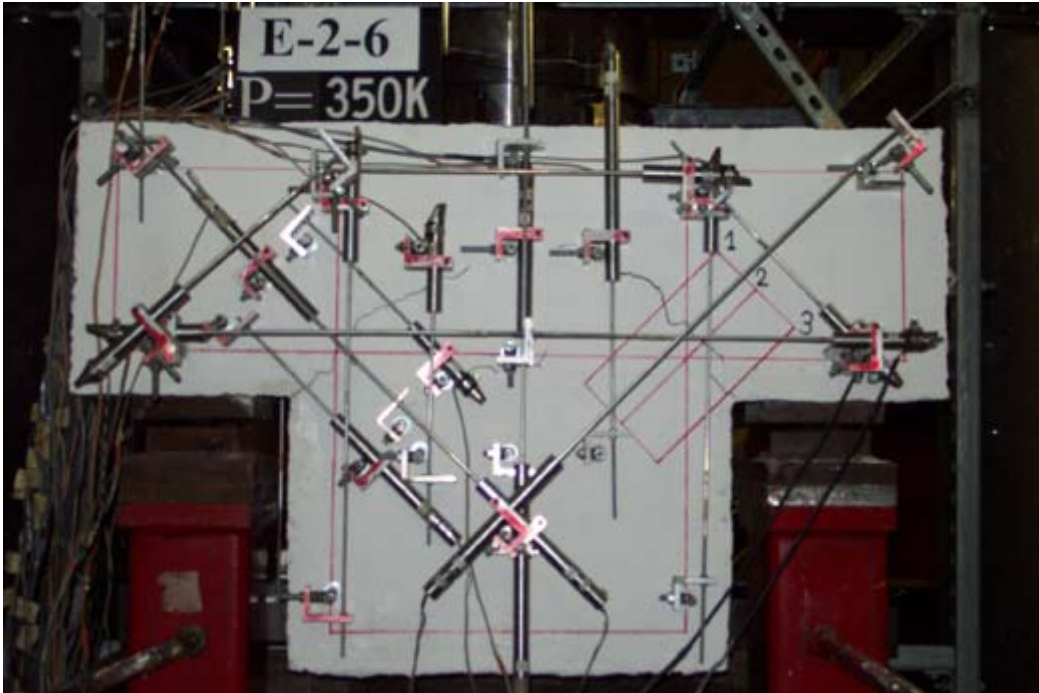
(a) Diagonal cracks in Specimen E-2-6
